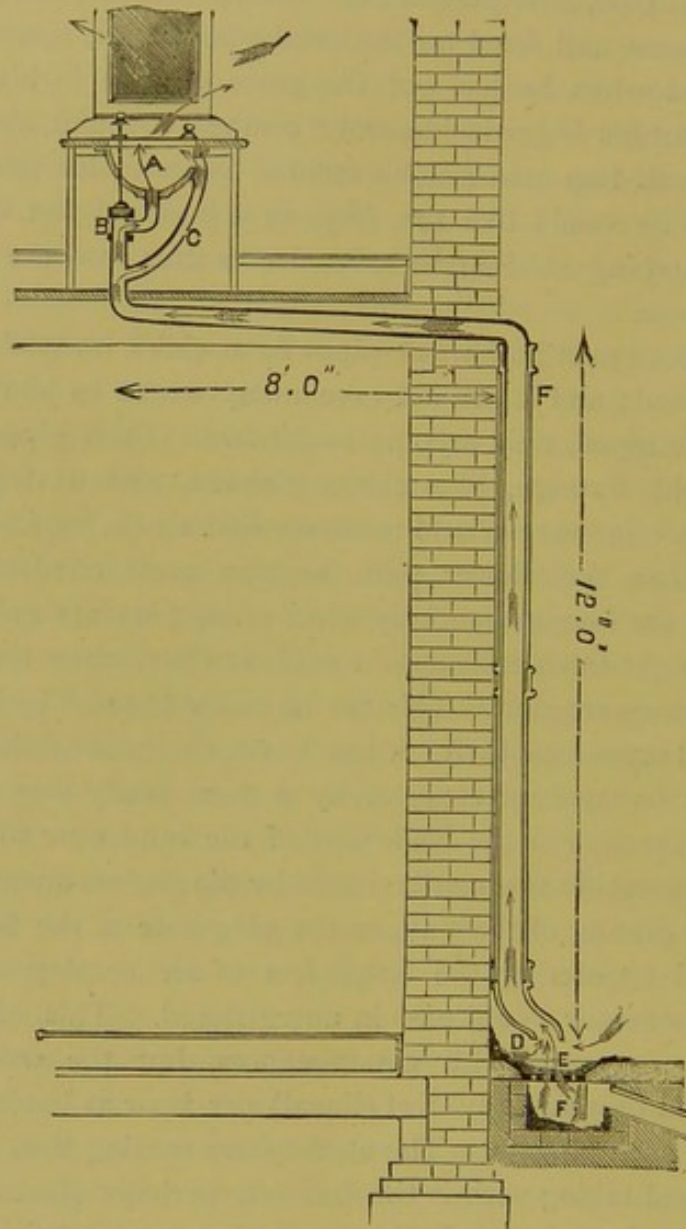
Untrapped Lavatory Waste ;—a bad arrangement.
